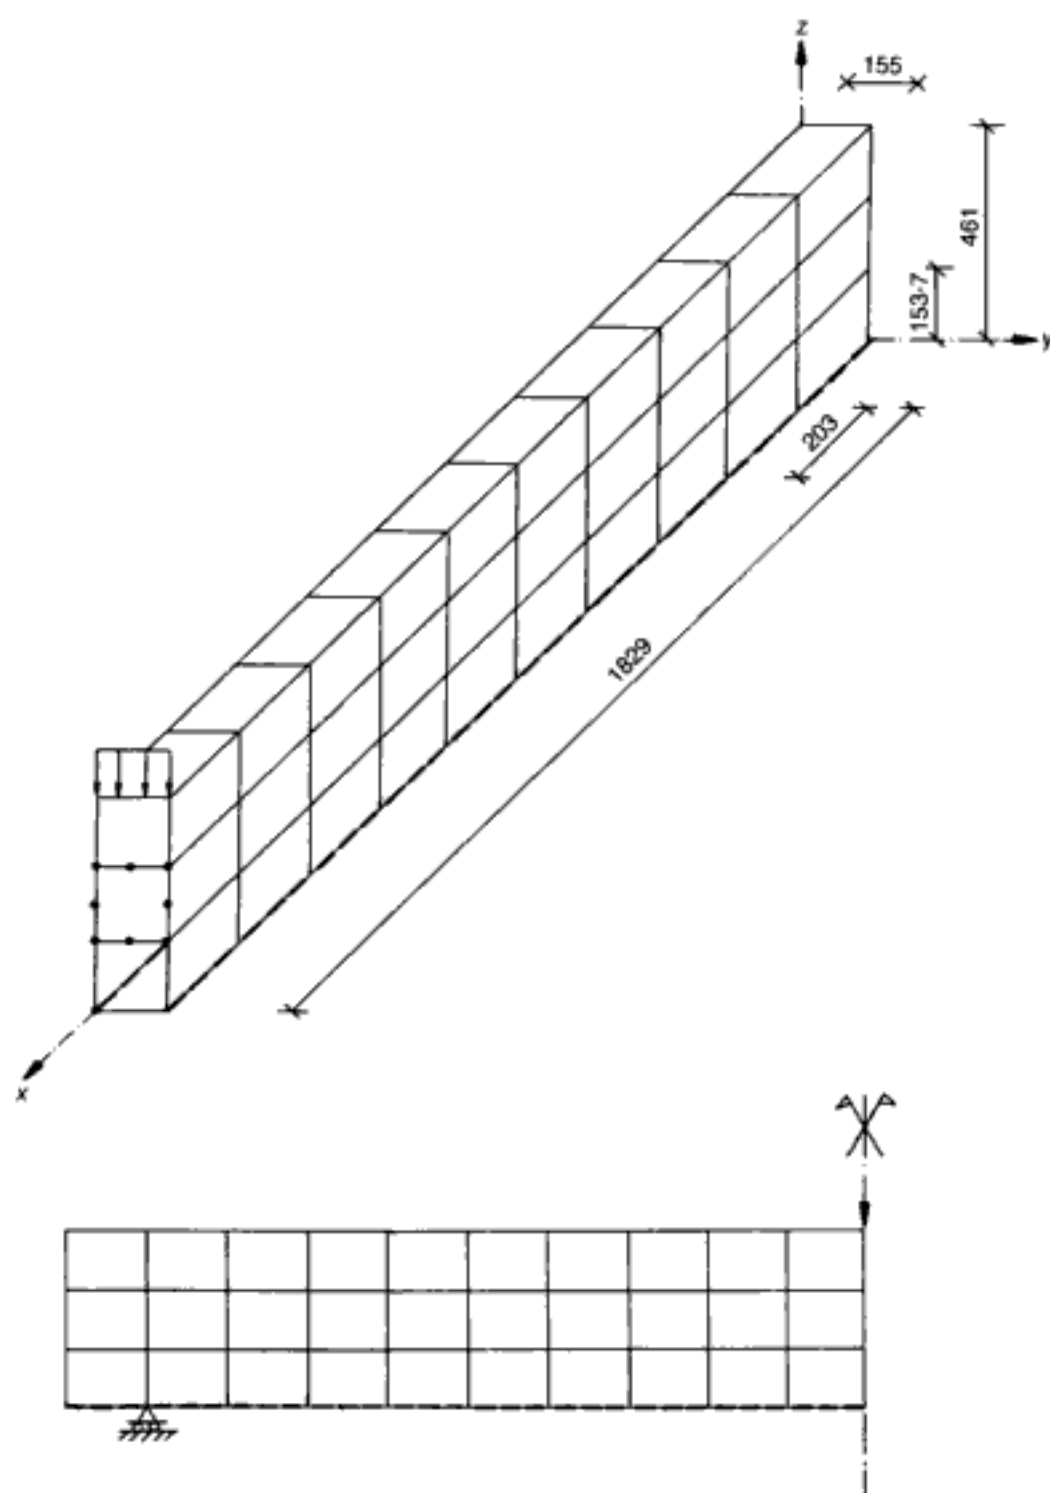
RC beam without stirrups under central point loading (CS3). FE mesh for one-quarter of the structure, consisting of 30 brick elements (all dimensions in mm)¹⁶¹
